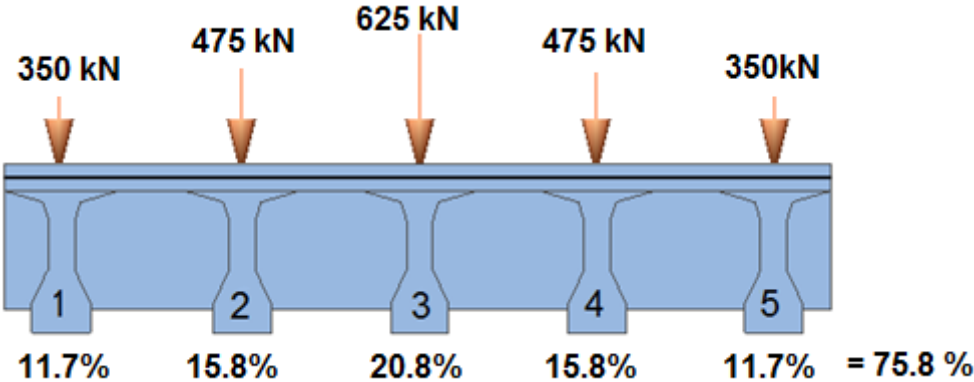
load distribution determined with the tests results, over five girders with the girder load on each beam
